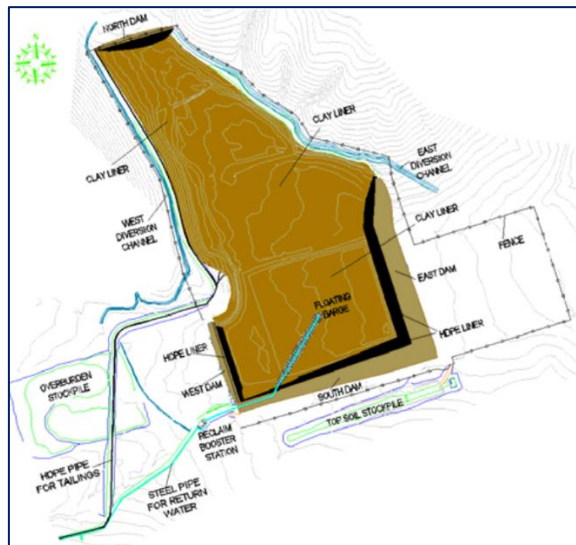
Tailing storage facility plan of Boroo gold mine (57)
